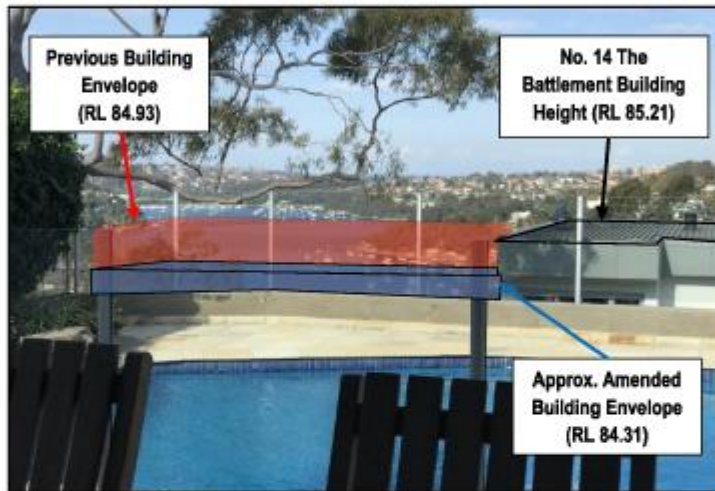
Standing views obtained from No. 14 The Battlements first floor dining room window
